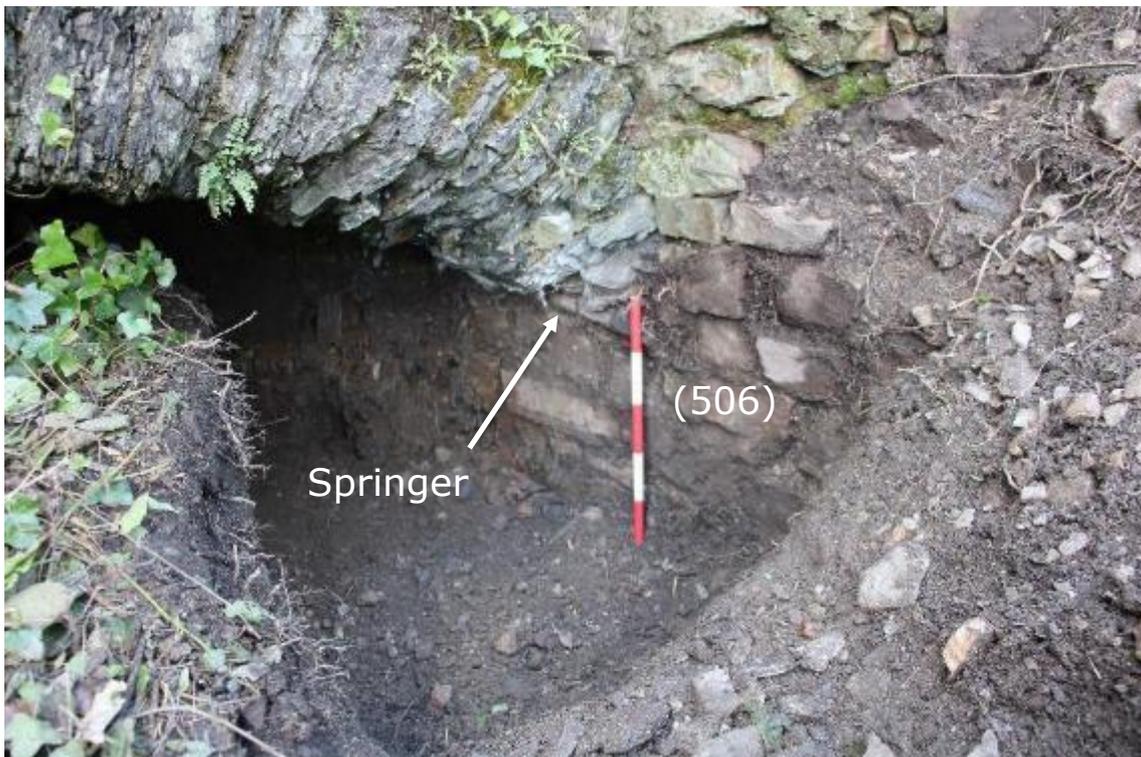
View SW at springer of arch in wall (506) – 0.5m scale
